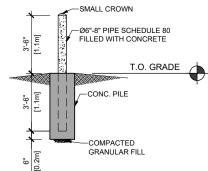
### DETAIL - BARRIER FREE PARKING SIGNAGE
